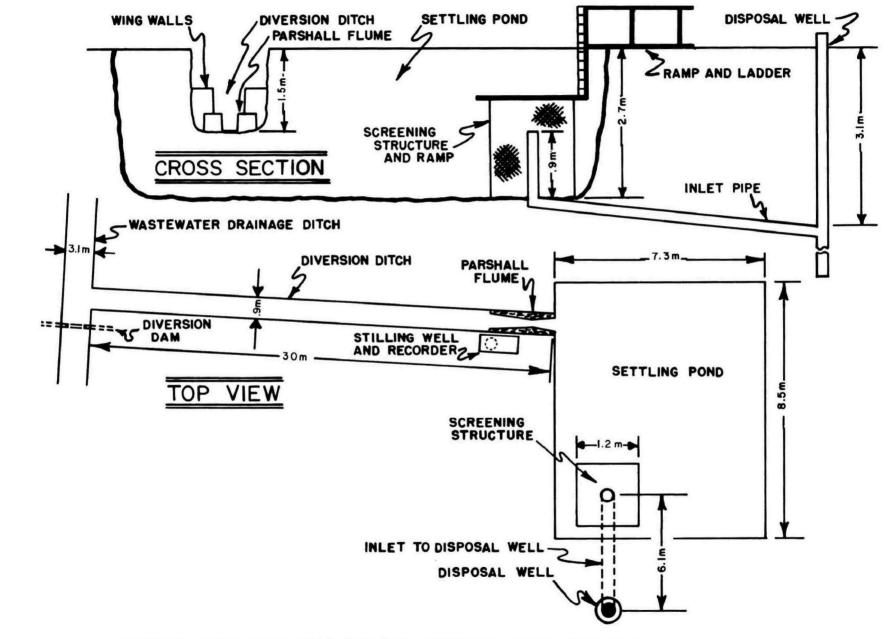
SITE FACILITIES FOR THE DISPOSAL WELL PROJECT.
